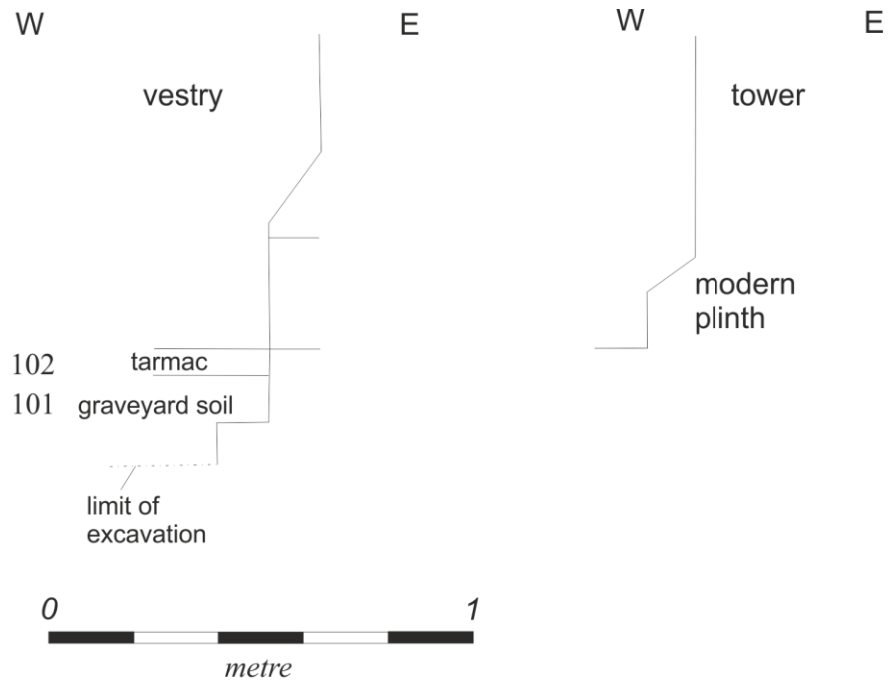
Sections at A marked on Fig. 2 showing profile of vestry and tower walls at point where the service trench exits the church. Scale 1:20.
